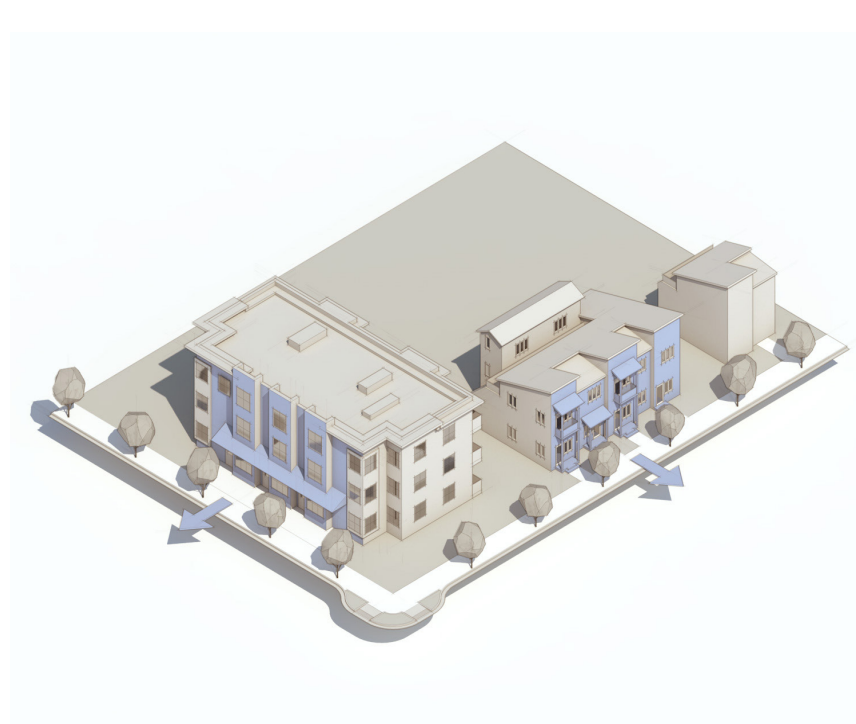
Orient primary building facades and entrances toward the street (see M at right).
